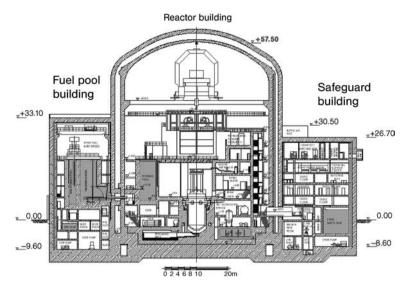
Reactor building with fuel element storage and safety building of a PWR-EPR type [22]
